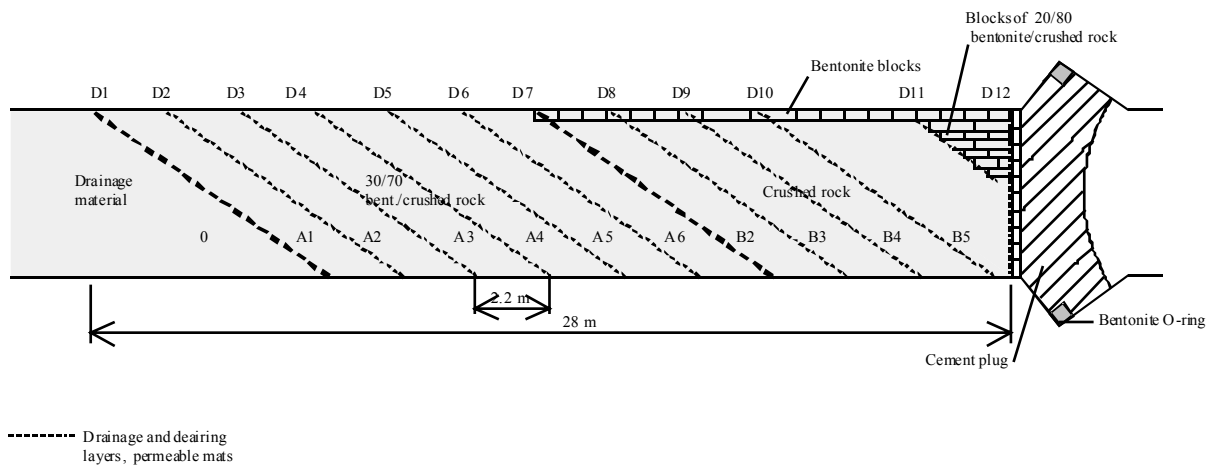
Numbering of backfill sections and drainage layers (permeable mats).
